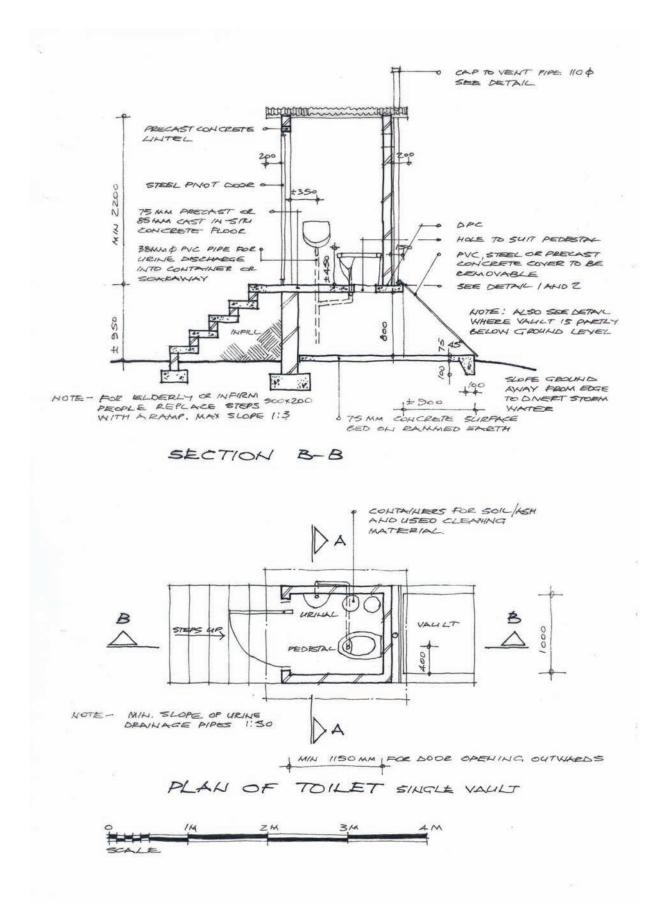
(a): Details of a single vault UD toilet. The number of steps at the entrance can be reduced by constructing the floor of the vault below ground level (see Figure 2.4(c)). (Drawing: MC Bolton)
